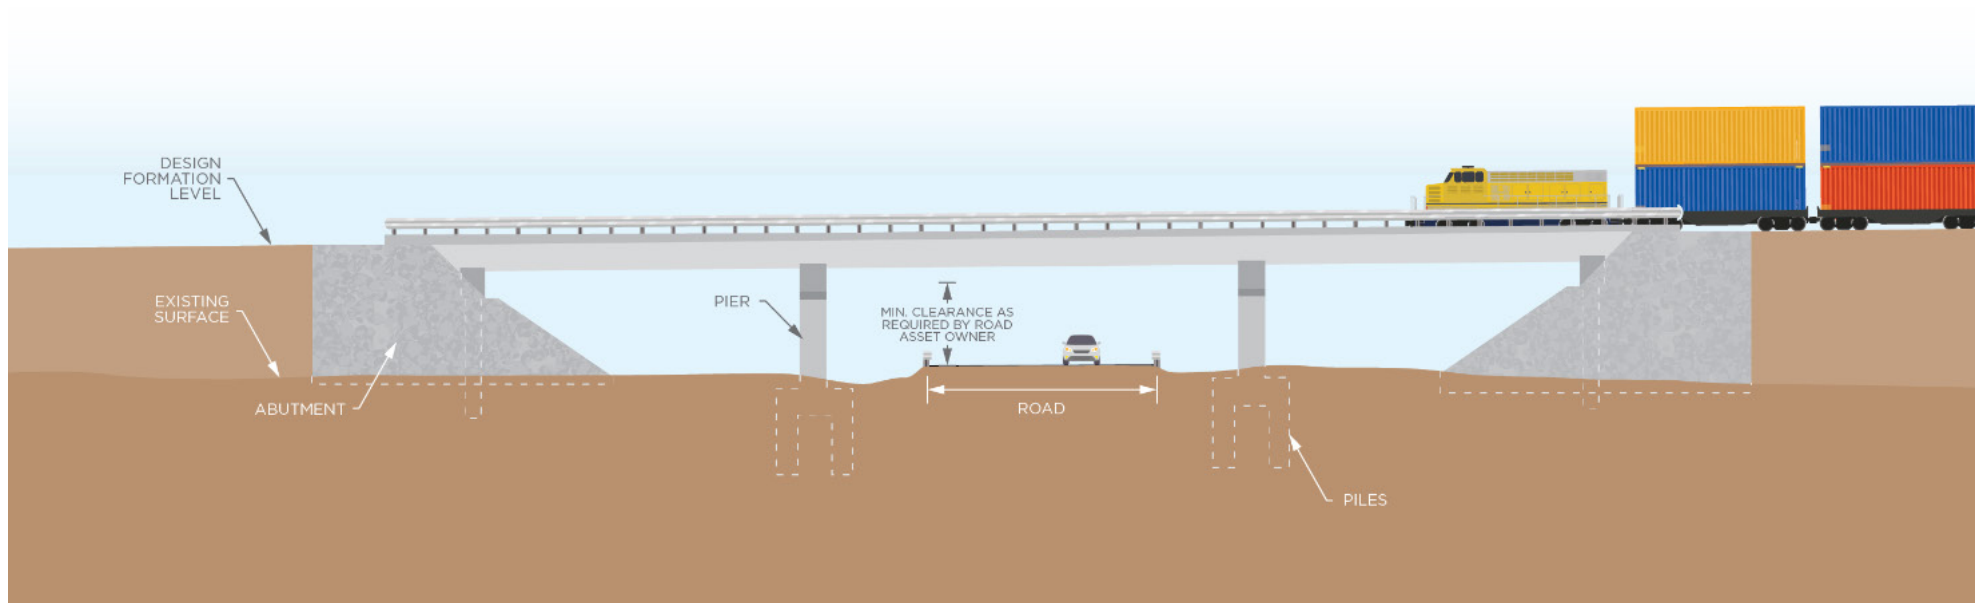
TYPICAL SECTION OF RAIL-OVER-ROAD BRIDGE STRUCTURE
